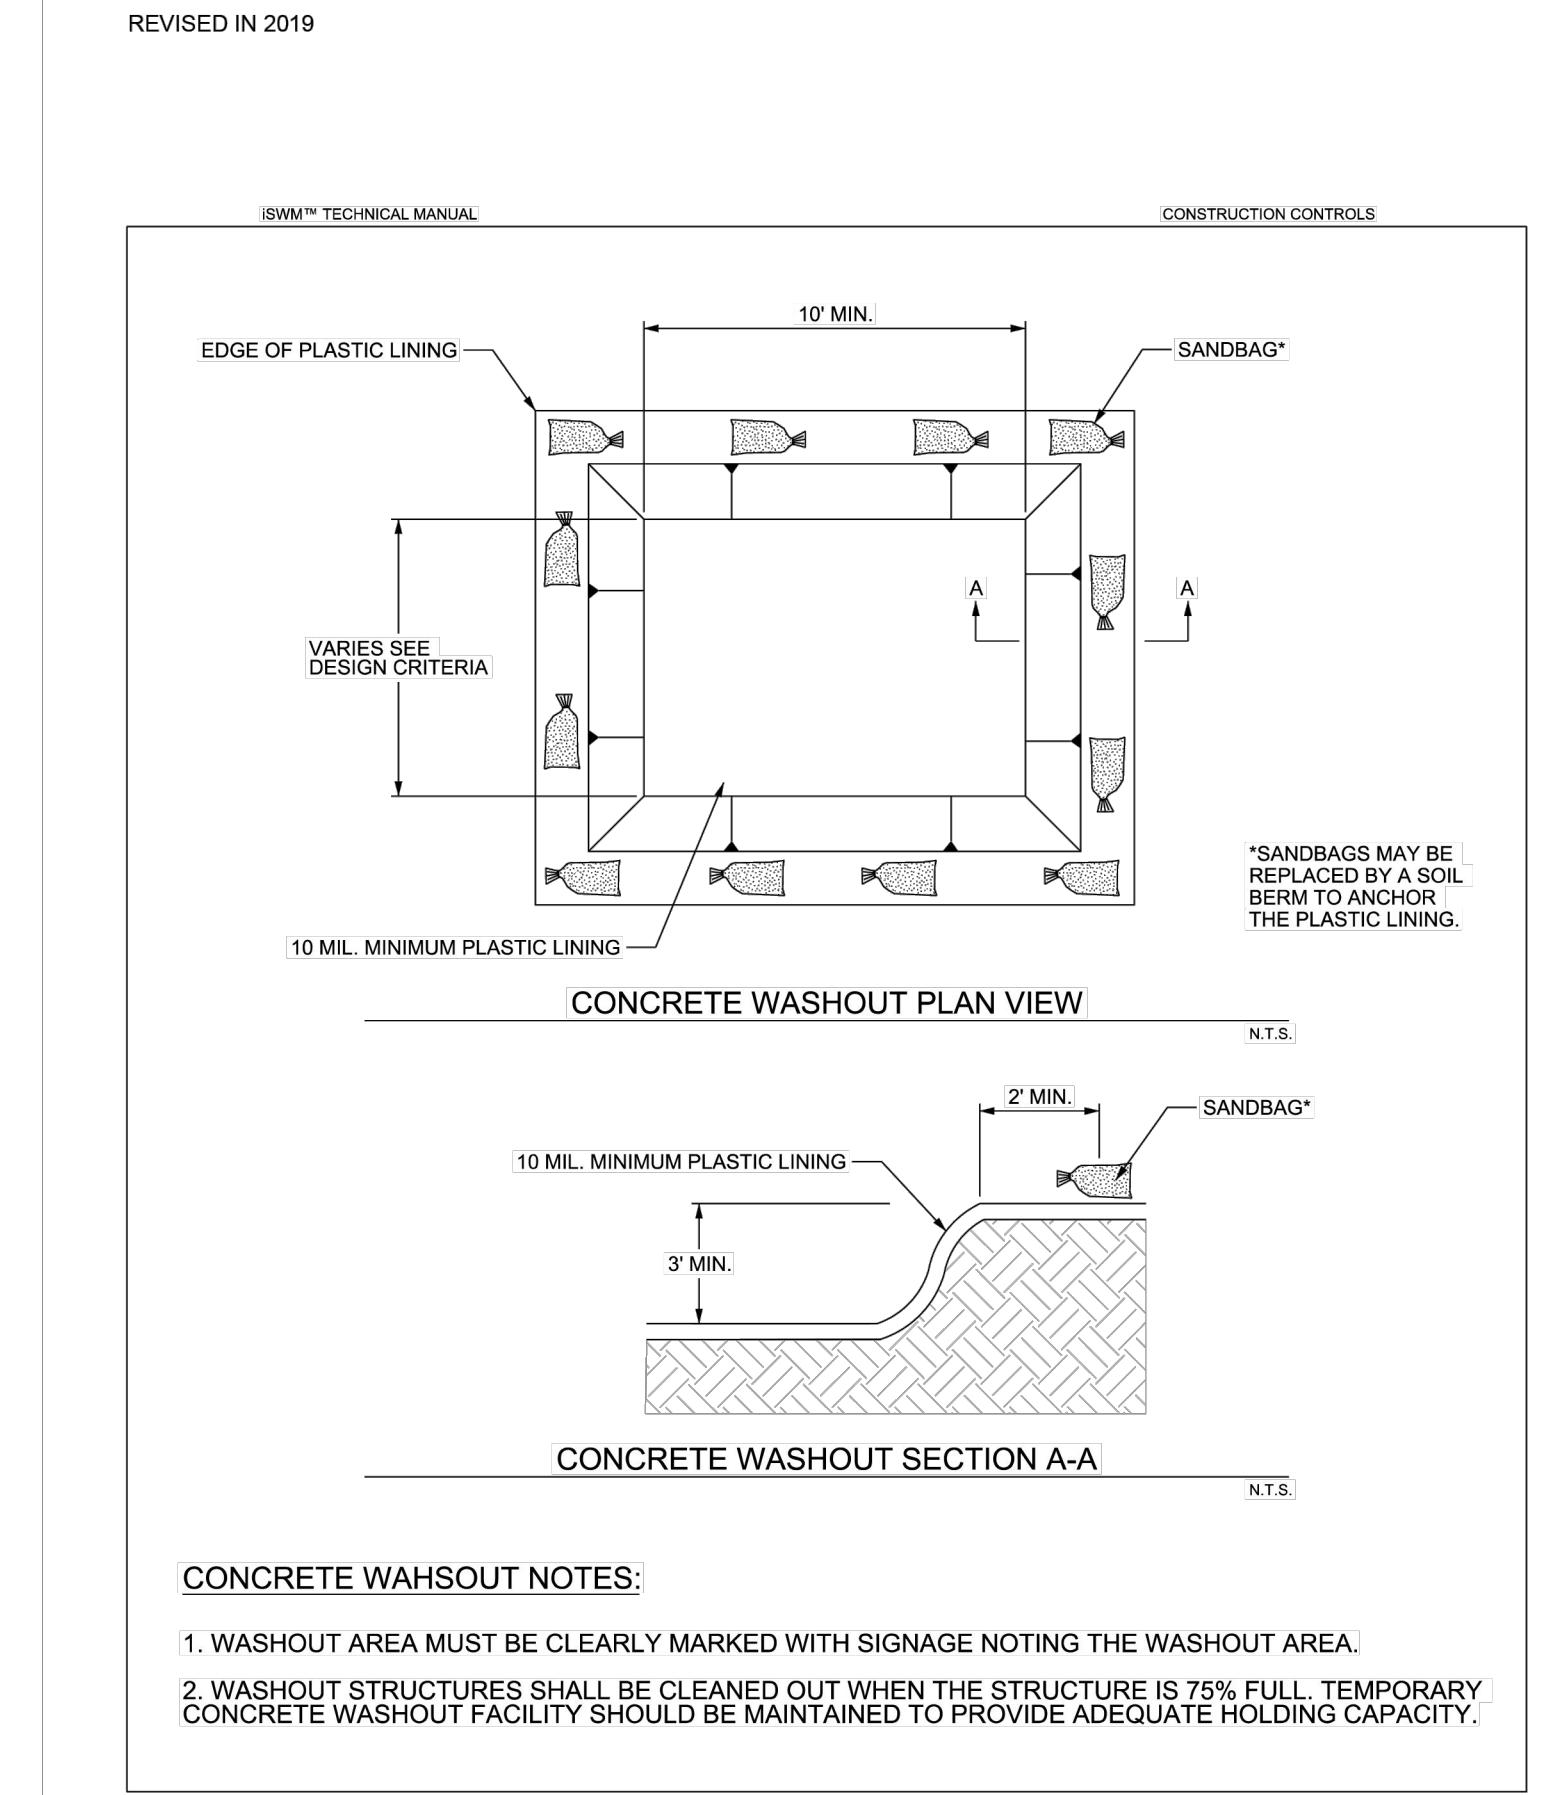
SCHEMATICS OF CONCRETE WASHOUT CONTAINMENT
